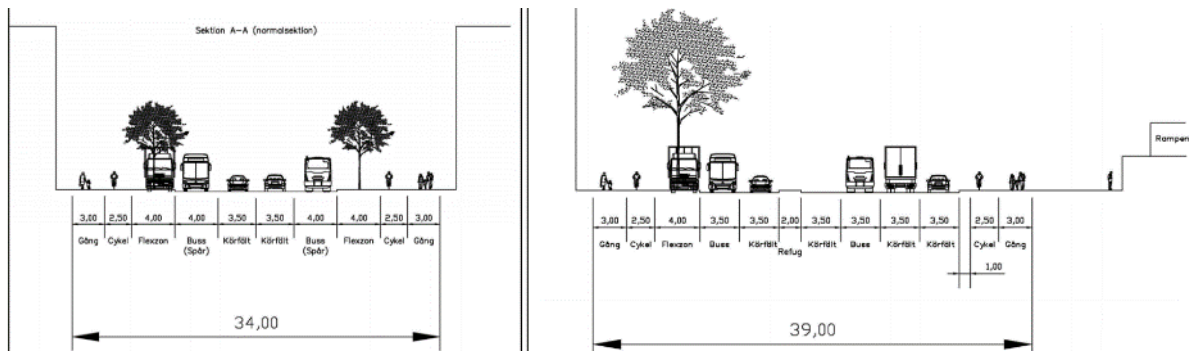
Suggestions for transport modes' future dedicated rooms on Hans Michelsensgatan. Standard section to the left, the section for larger crossings to the right. (Detailed development plan Smörkajen, City of Malmö).
